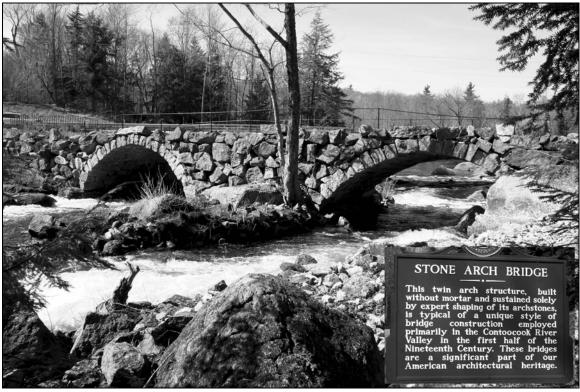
Twin Stone Arch Bridge (Hillsborough, NH Bridge No.182/105)
